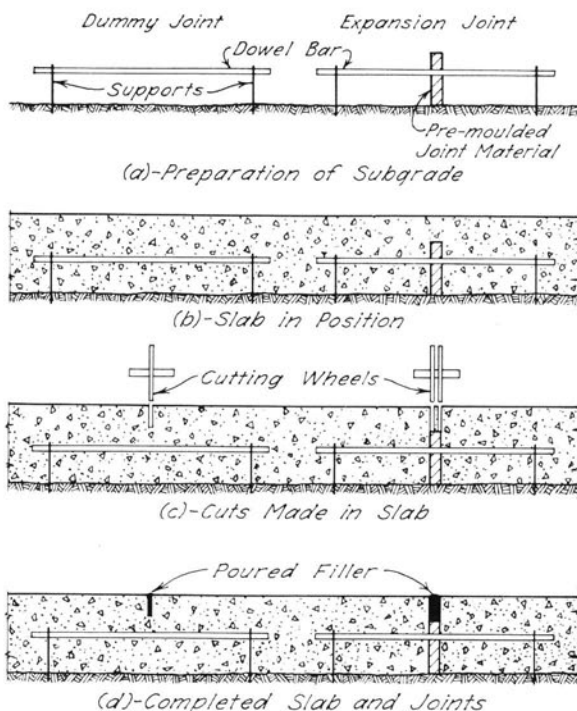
PROCESSES IN JOINT CONSTRUCTION IN A CONCRETE PAVEMENT, USING A ROTATING CUTTING WHEEL
